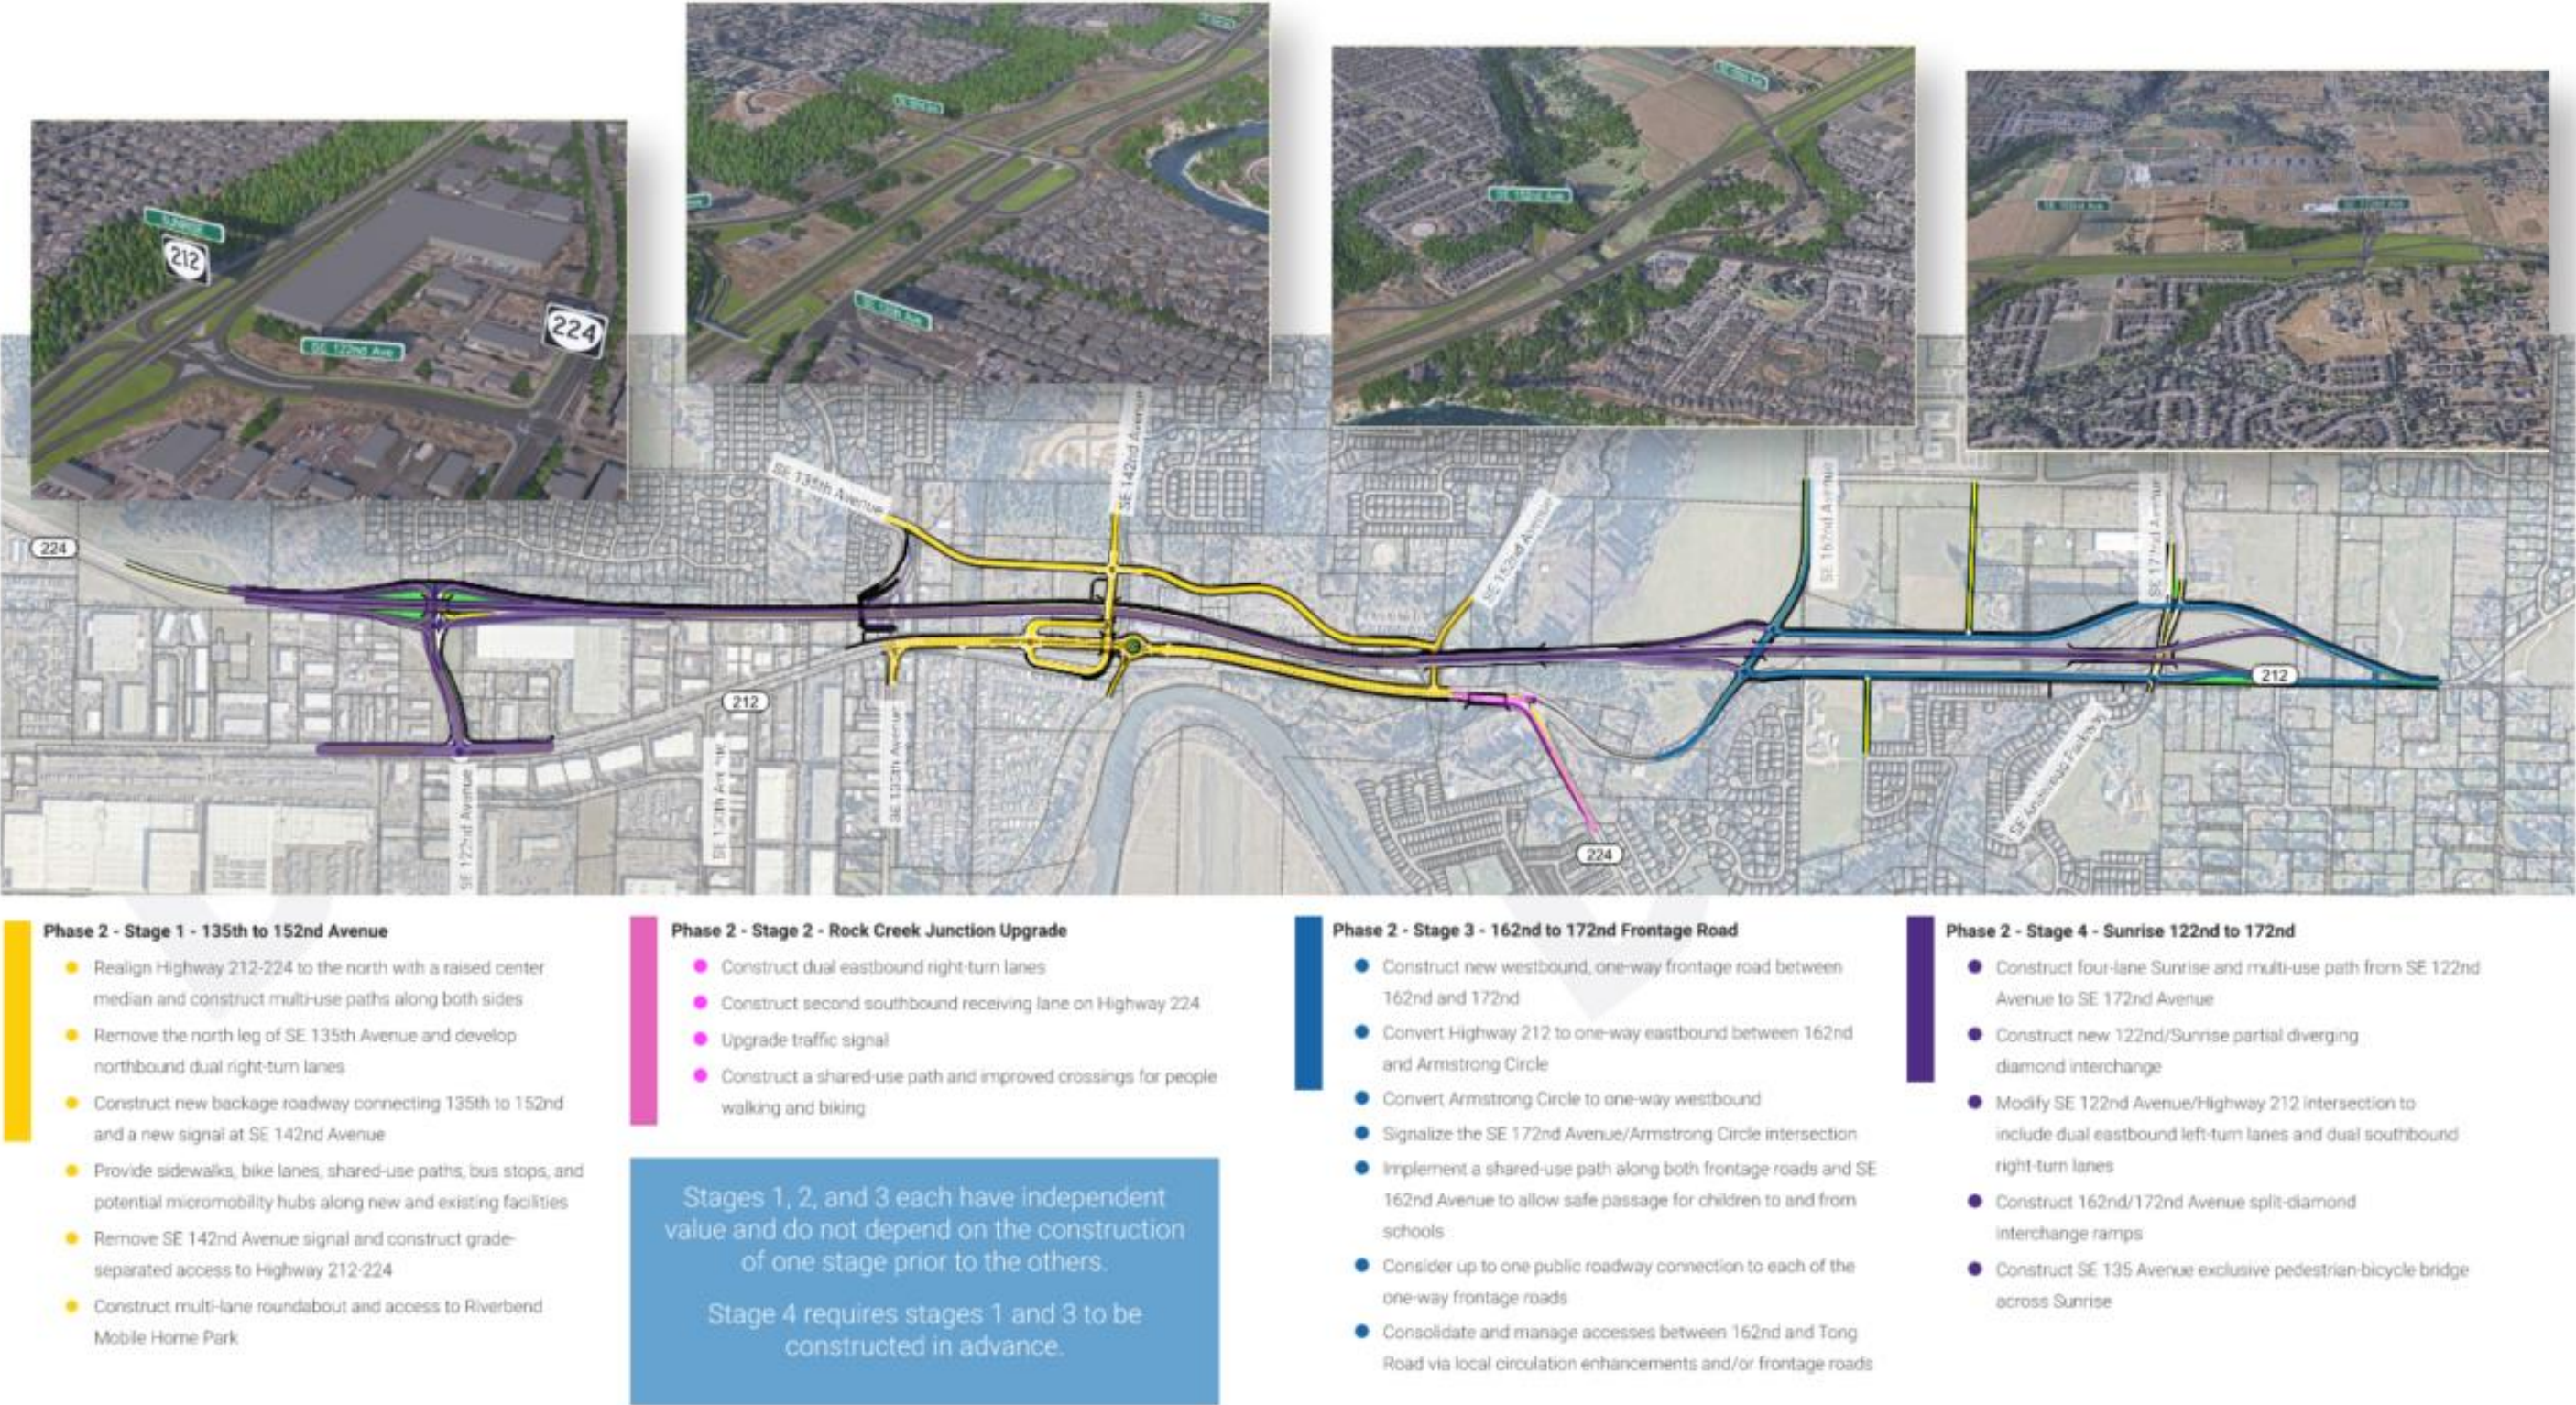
Sunrise Gateway Corridor Refinement Plan Alternative and Conceptual Construction Staging Plan
